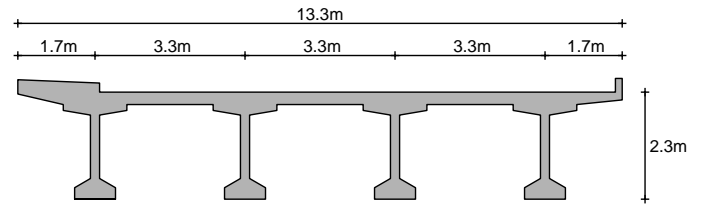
Section of the bridge deck, comprised of four precast, pretensioned I-beams and a cast-in-place deck slab.
